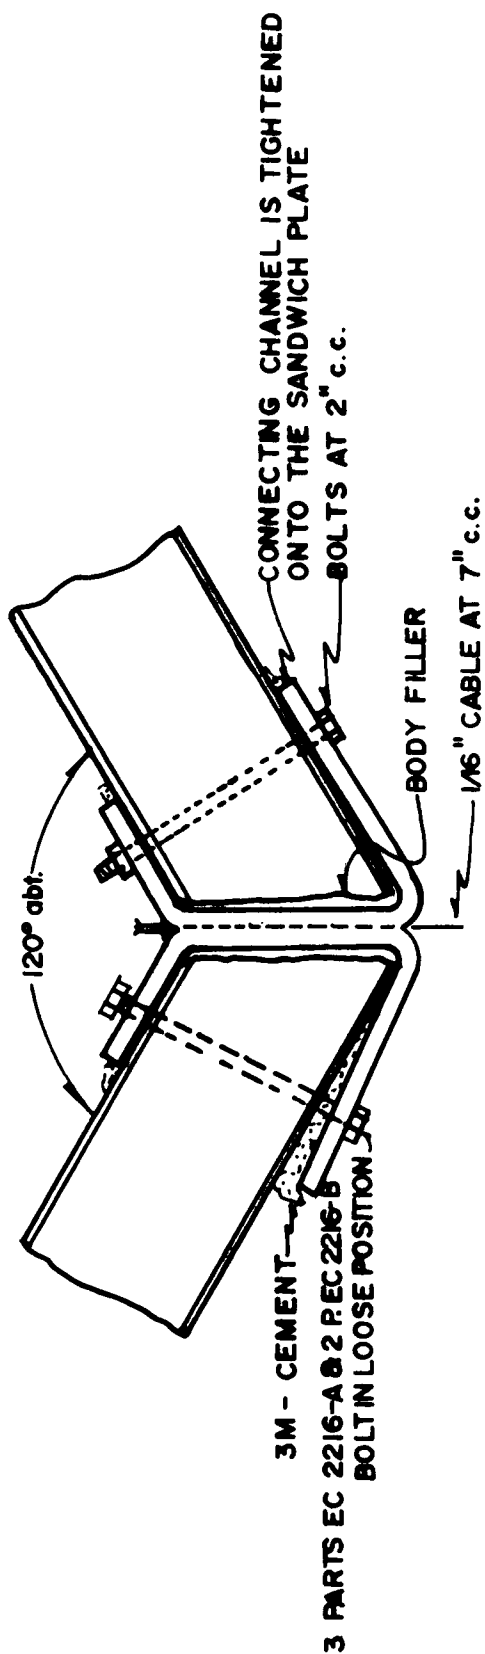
TYPICAL CONNECTION USED TO JOIN SANDWICH PANELS AT THE RIDGES OF THE FOLDED PLATE MODELS
